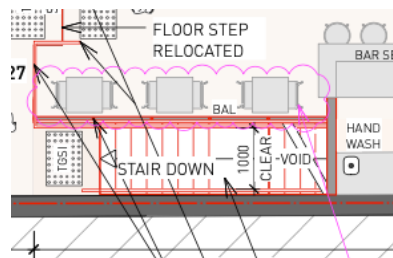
, First Floor: Fixed bar seating replaced with tables and chairs
